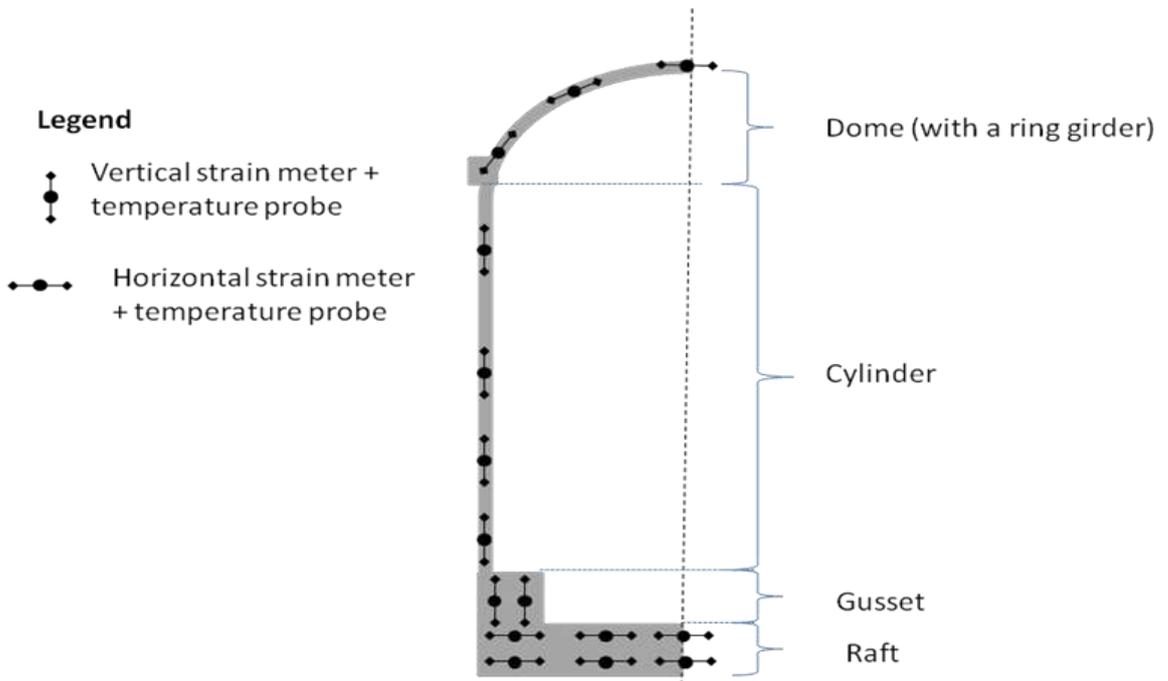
Typical embedded sensors layout on a developed view of the cylinder
